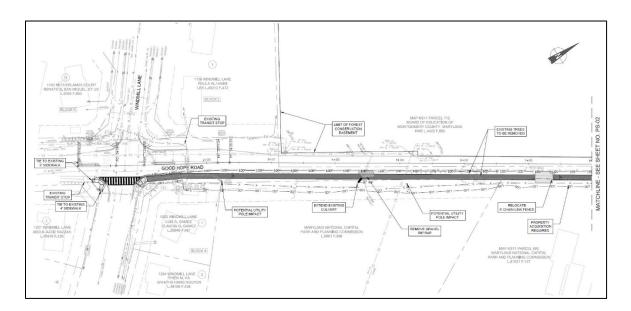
Sidepath Improvements – East Side - Windmill Lane
